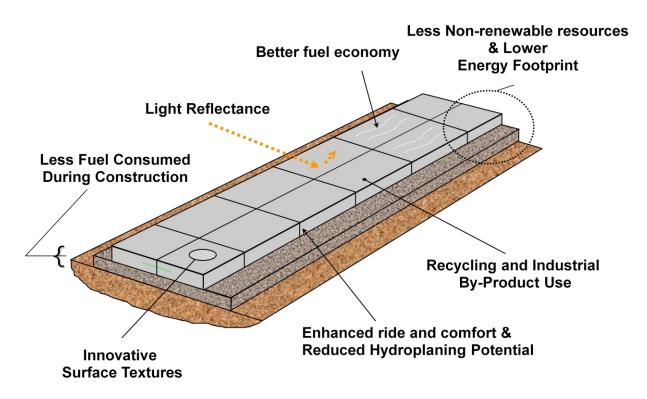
Concrete Pavements Many Sustainability Benefits Beyond Longevity Source: Helping Build A Sustainable Future by Constructing Roadways with Portland Cement Concrete Pavement [Smith 2006]
